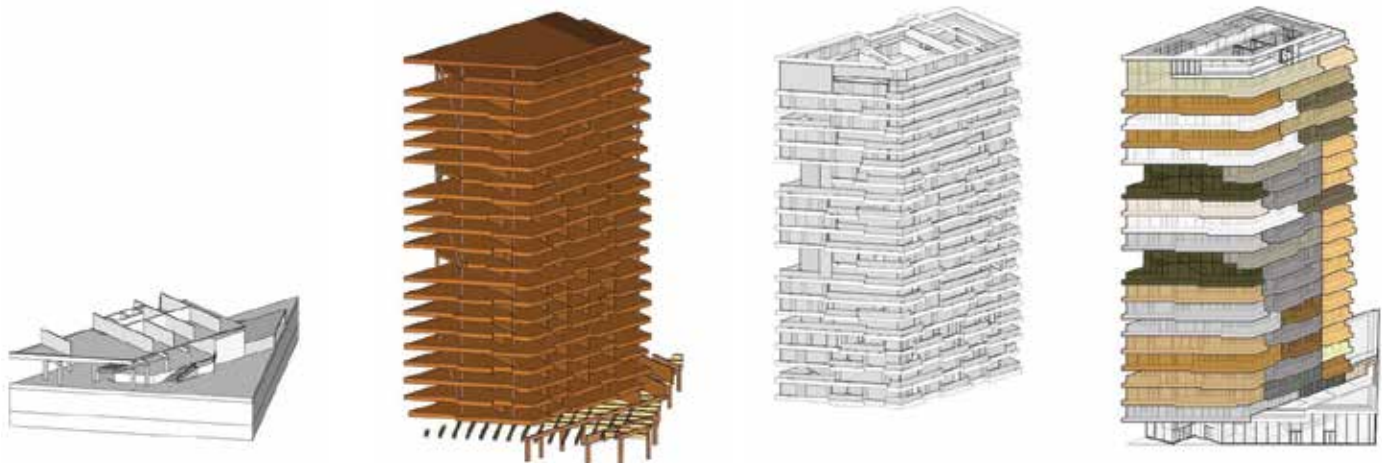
Hout, a 21-story tower in Amsterdam. From left to right: concrete base, load-bearing timber structure, glass façade, multiple apartment layouts. © Jannes Linders/Team V Architecture
